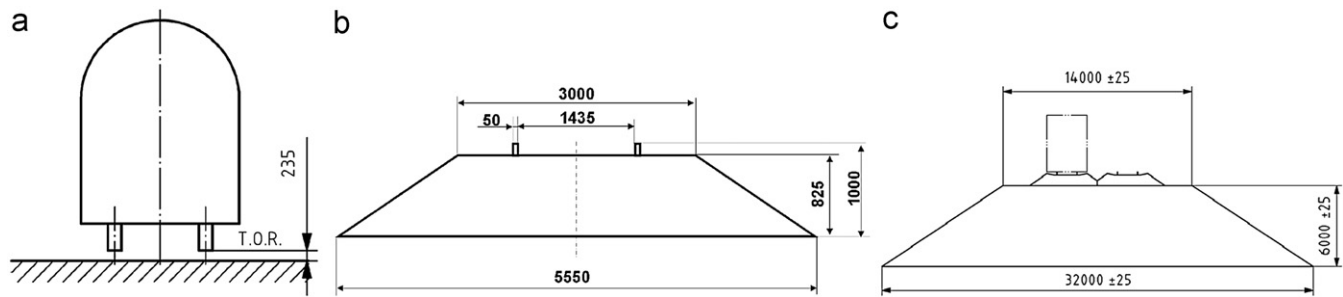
Tested wind tunnel ground configurations CEN, 2008: (a) true flat ground, (b) ballast and rail flat ground, (c) 6 m embankment.
